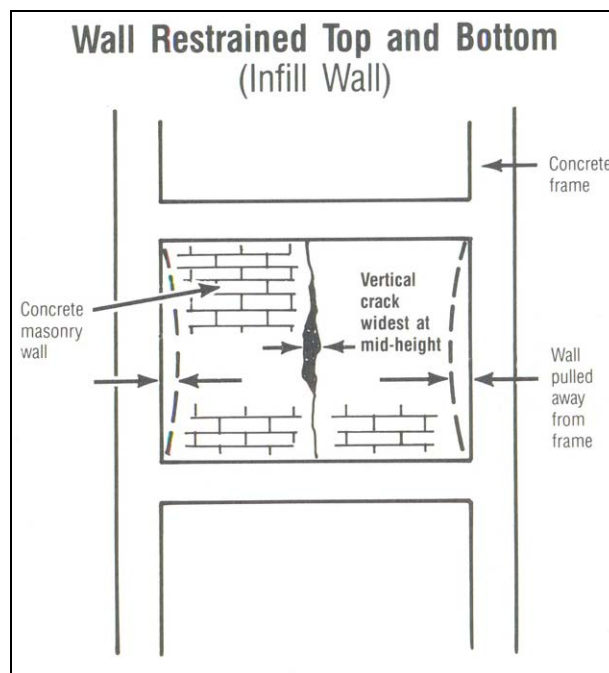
Wall crack due to shrinkage of mortar and concrete masonry unit (*Source: Nondestructive evaluation & testing of masonry structures by Suprenant and Schuller*)
